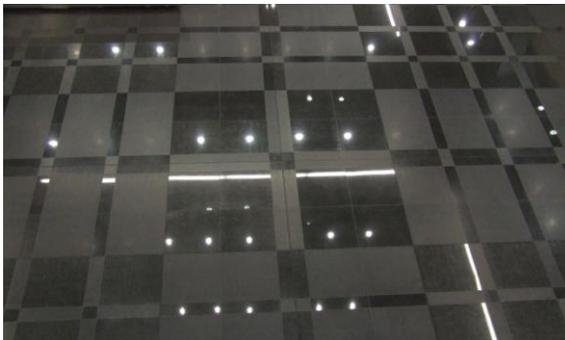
The NLL floor tile cover in the hall on the 1st floor [Source: photo by author private archive, 2014]
